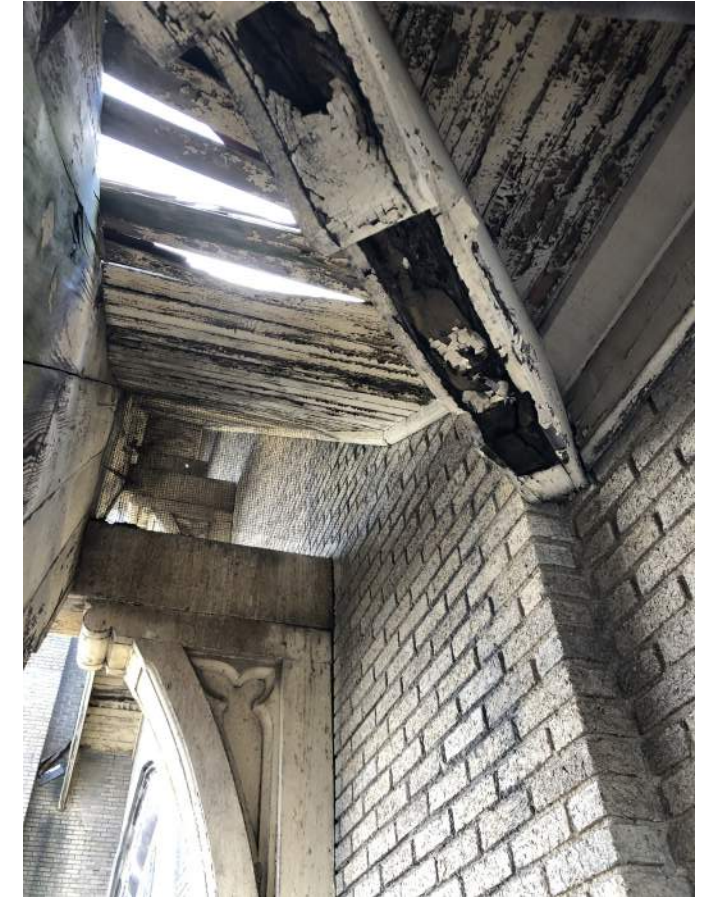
UNDERSIDE OF EAVES ON THE EAST ELEVATION AT THE MAIN ENTRANCE; WOOD DECKING IS DETERIORATION AT THE EAVE; MISSING WOOD DECKING; WEATHERED AND DECAYING SUPPORT BRACKETS
